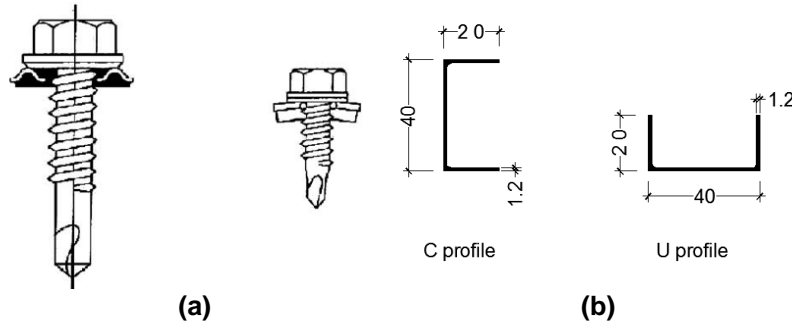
Self-drilling screw used as shear connector (a) and Cold formed member shapes and size, all dimensions in mm (b).
